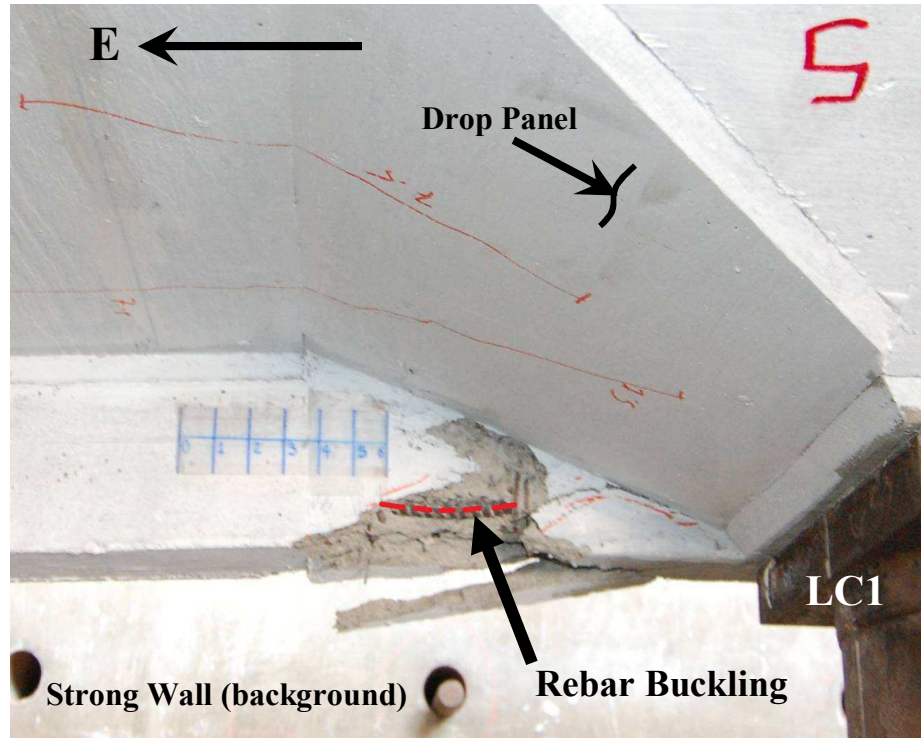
Rebar buckling and concrete spalling in EW-beam at support LC1 at the end of the test at the beam-beam corner on specimen 1.
